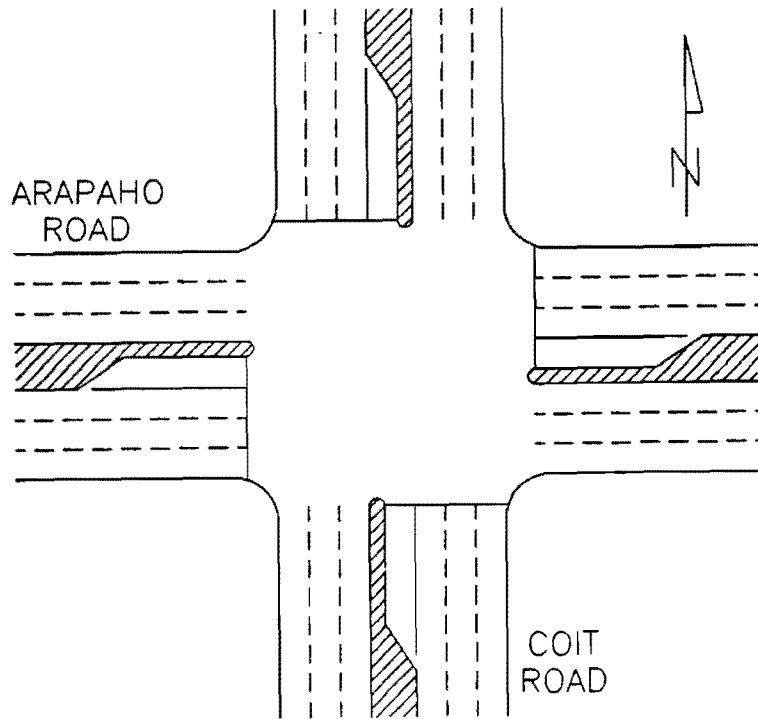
Coit Road and Arapaho Road, Richardson TX.
